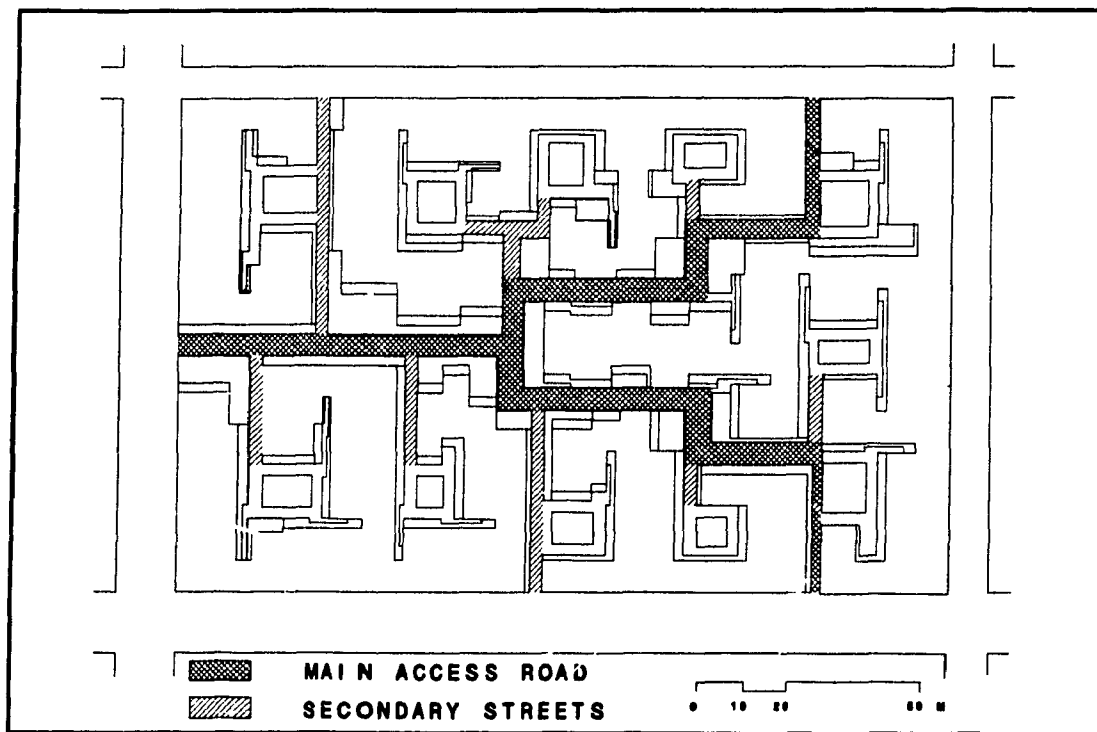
STREET PAVING - ALTERNATIVE # 1
